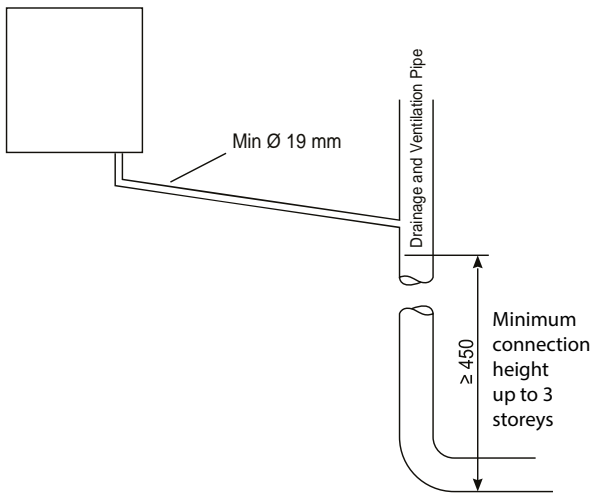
Connection of the Condensate Water Drainage Pipe to Internal Drainage and Ventilation Pipe
